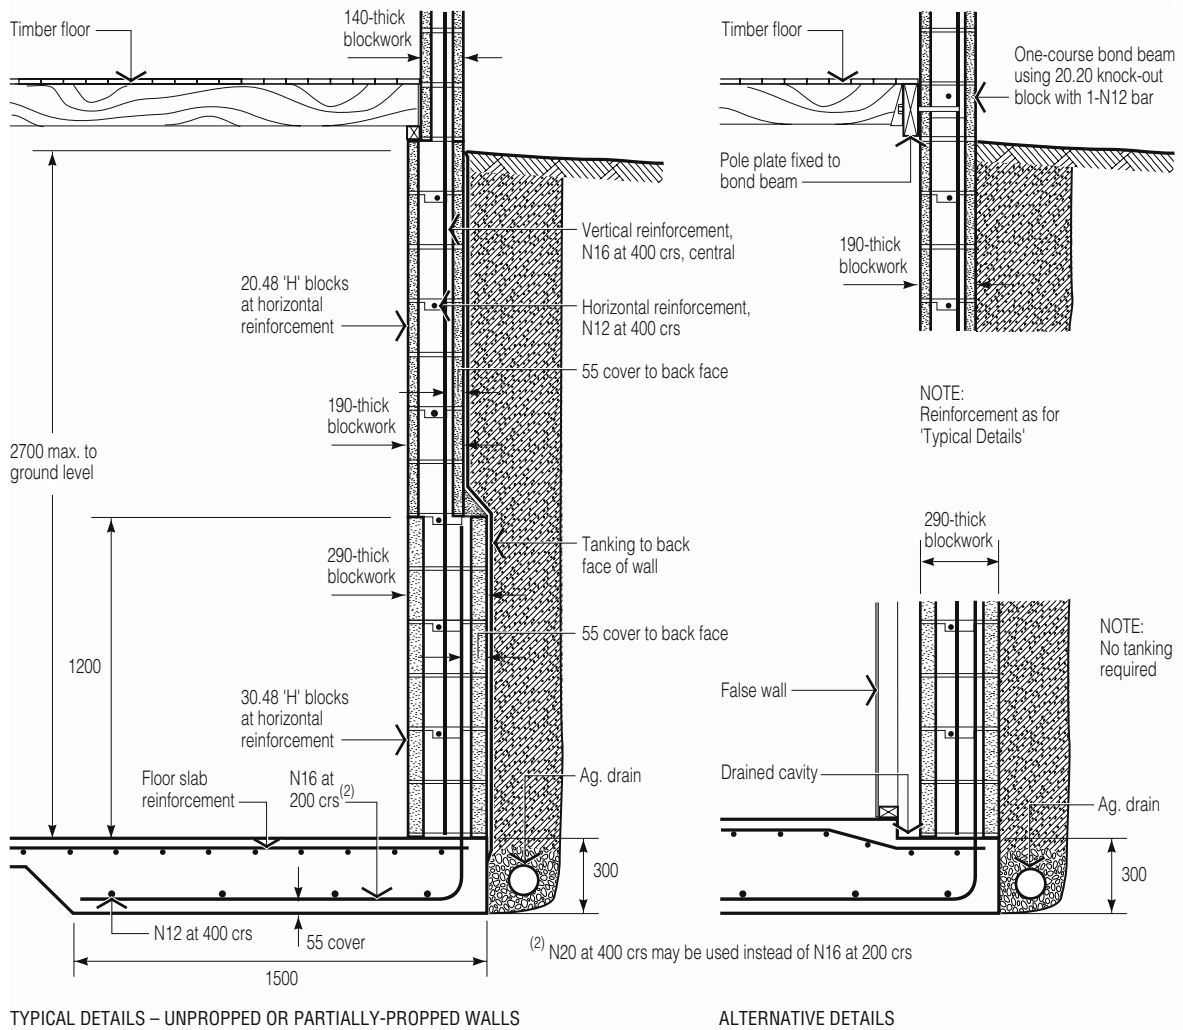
Typical Basement Wall Supporting a Timber Floor
